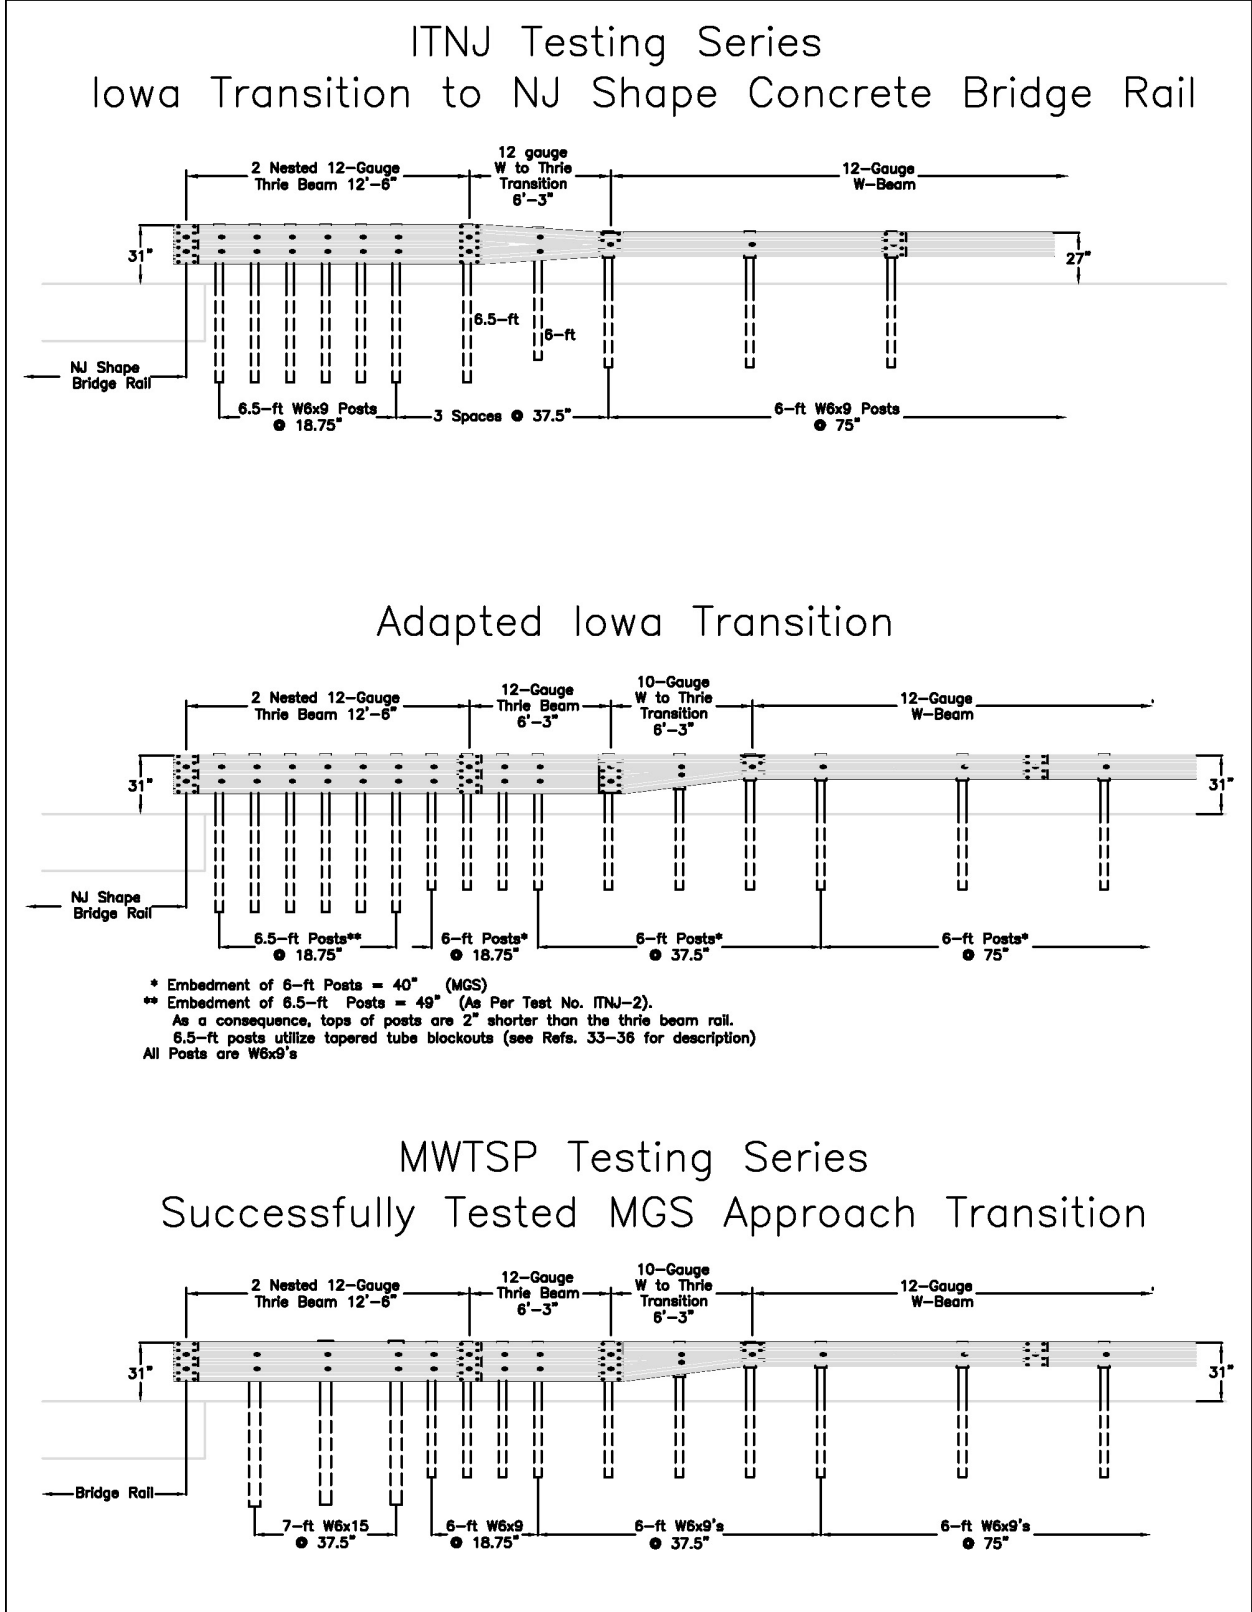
Attachment to Iowa Transition to NJ Shape Concrete Parapet, ITNJ Testing Series [36-39]
